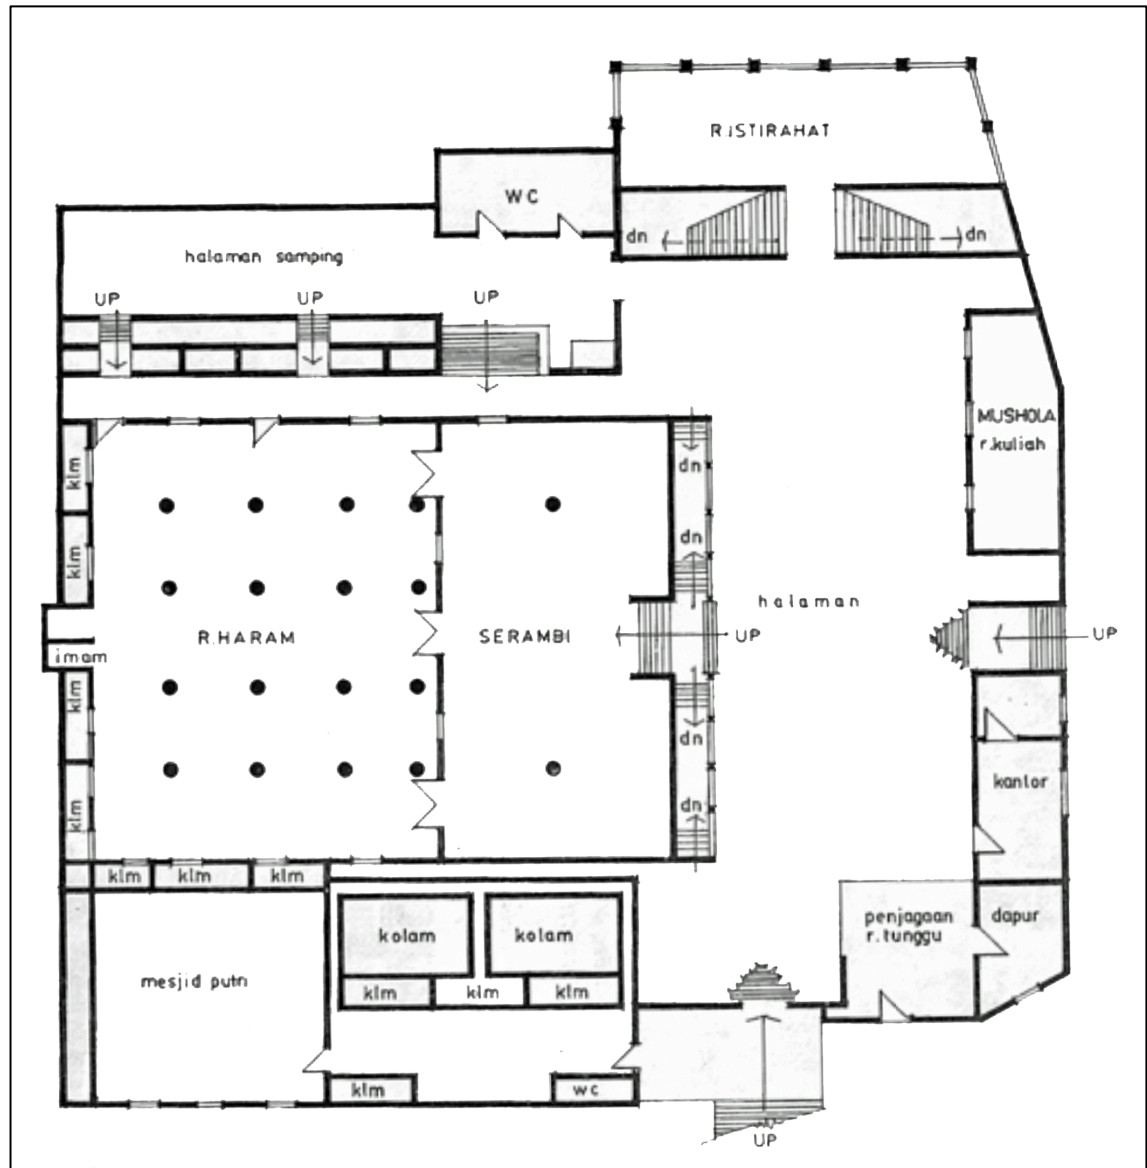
Floor plan that shows the main building is surrounded by moats (indicated by *klm*)
